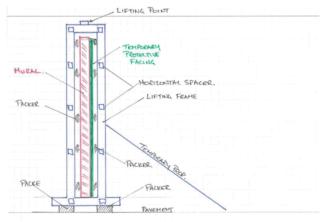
sketch of proposed method of support mural while being lifted out of position
